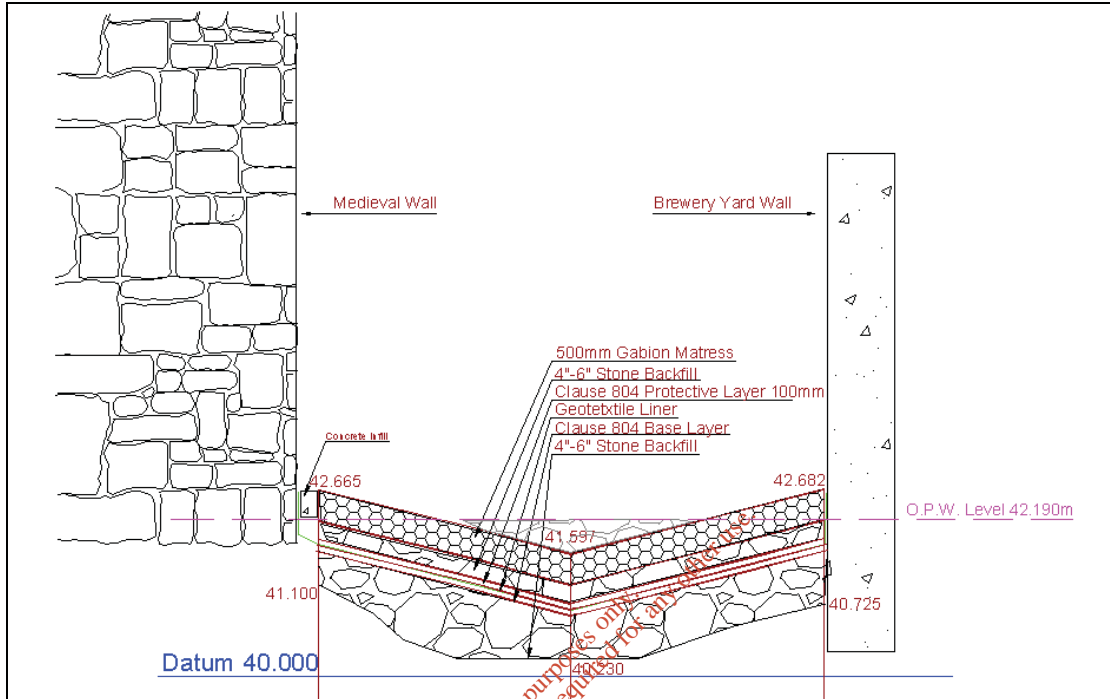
Typical Cross Section for Excavation Upstream of the On-site Bridge, Chainage 150 - 65
